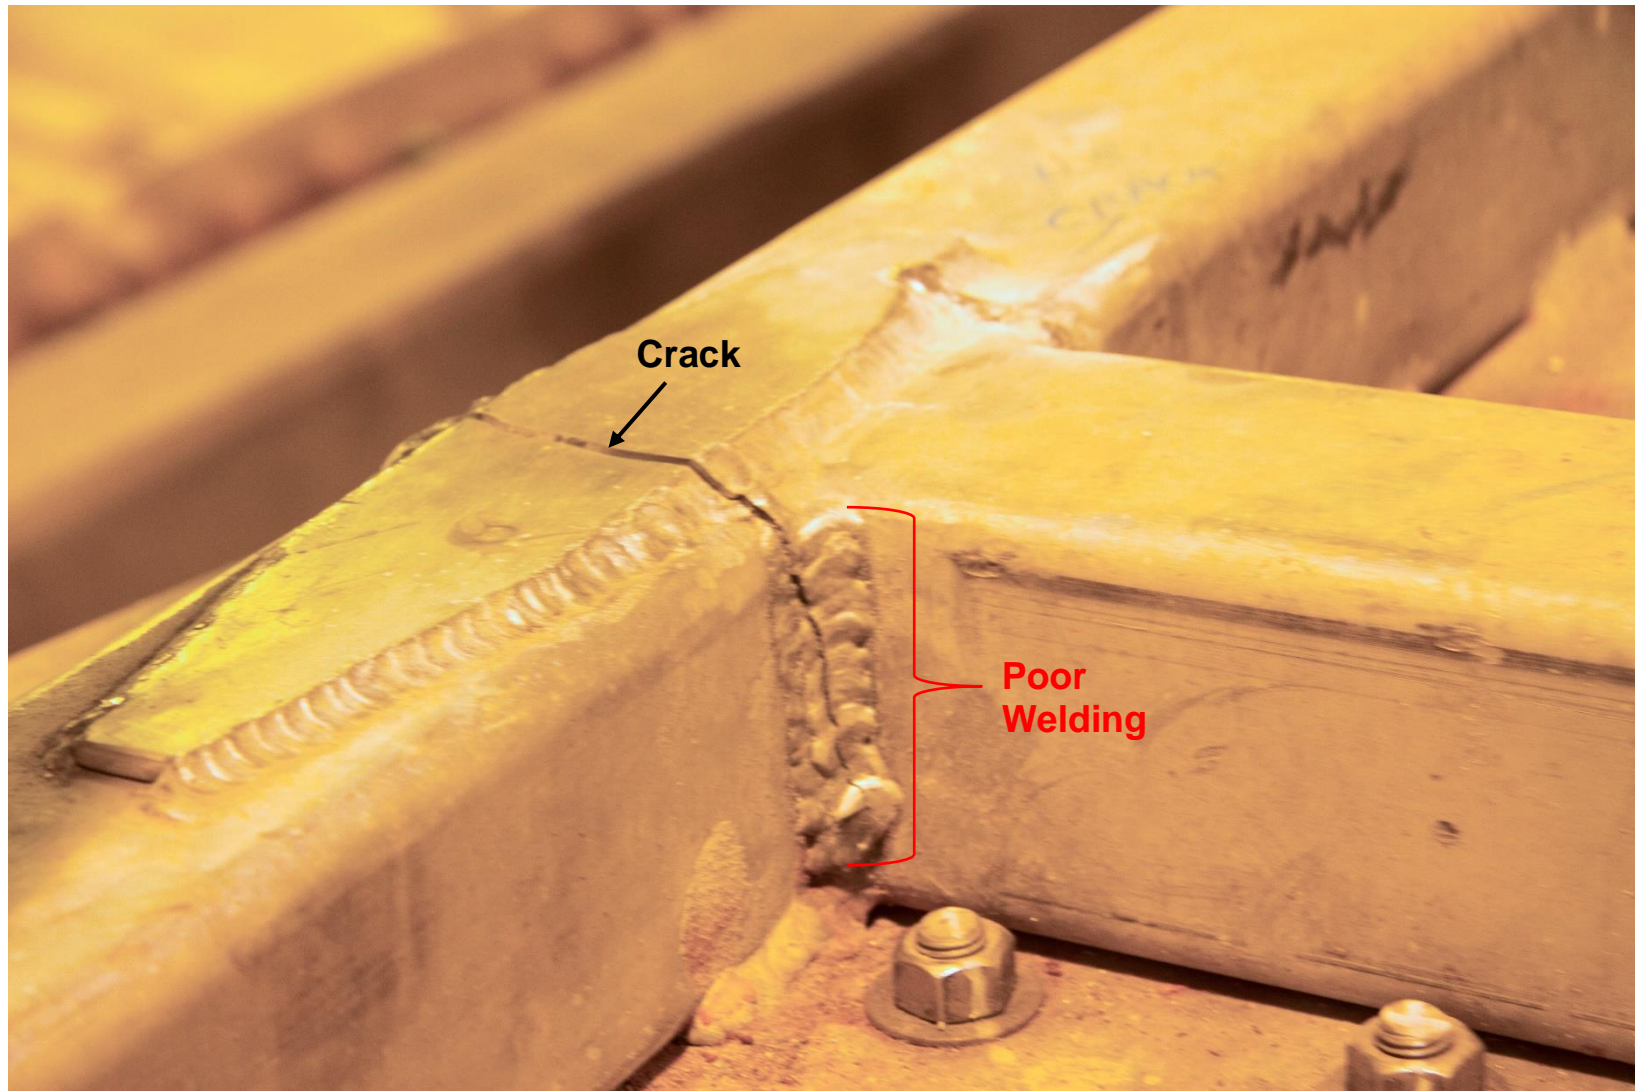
South-West Corner of Bridge, Location #11B – Cracking
